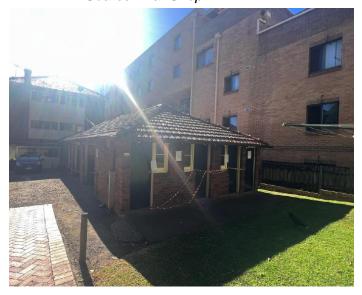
Existing rear garage, looking north from the rear of the site. Source: PlanShop
